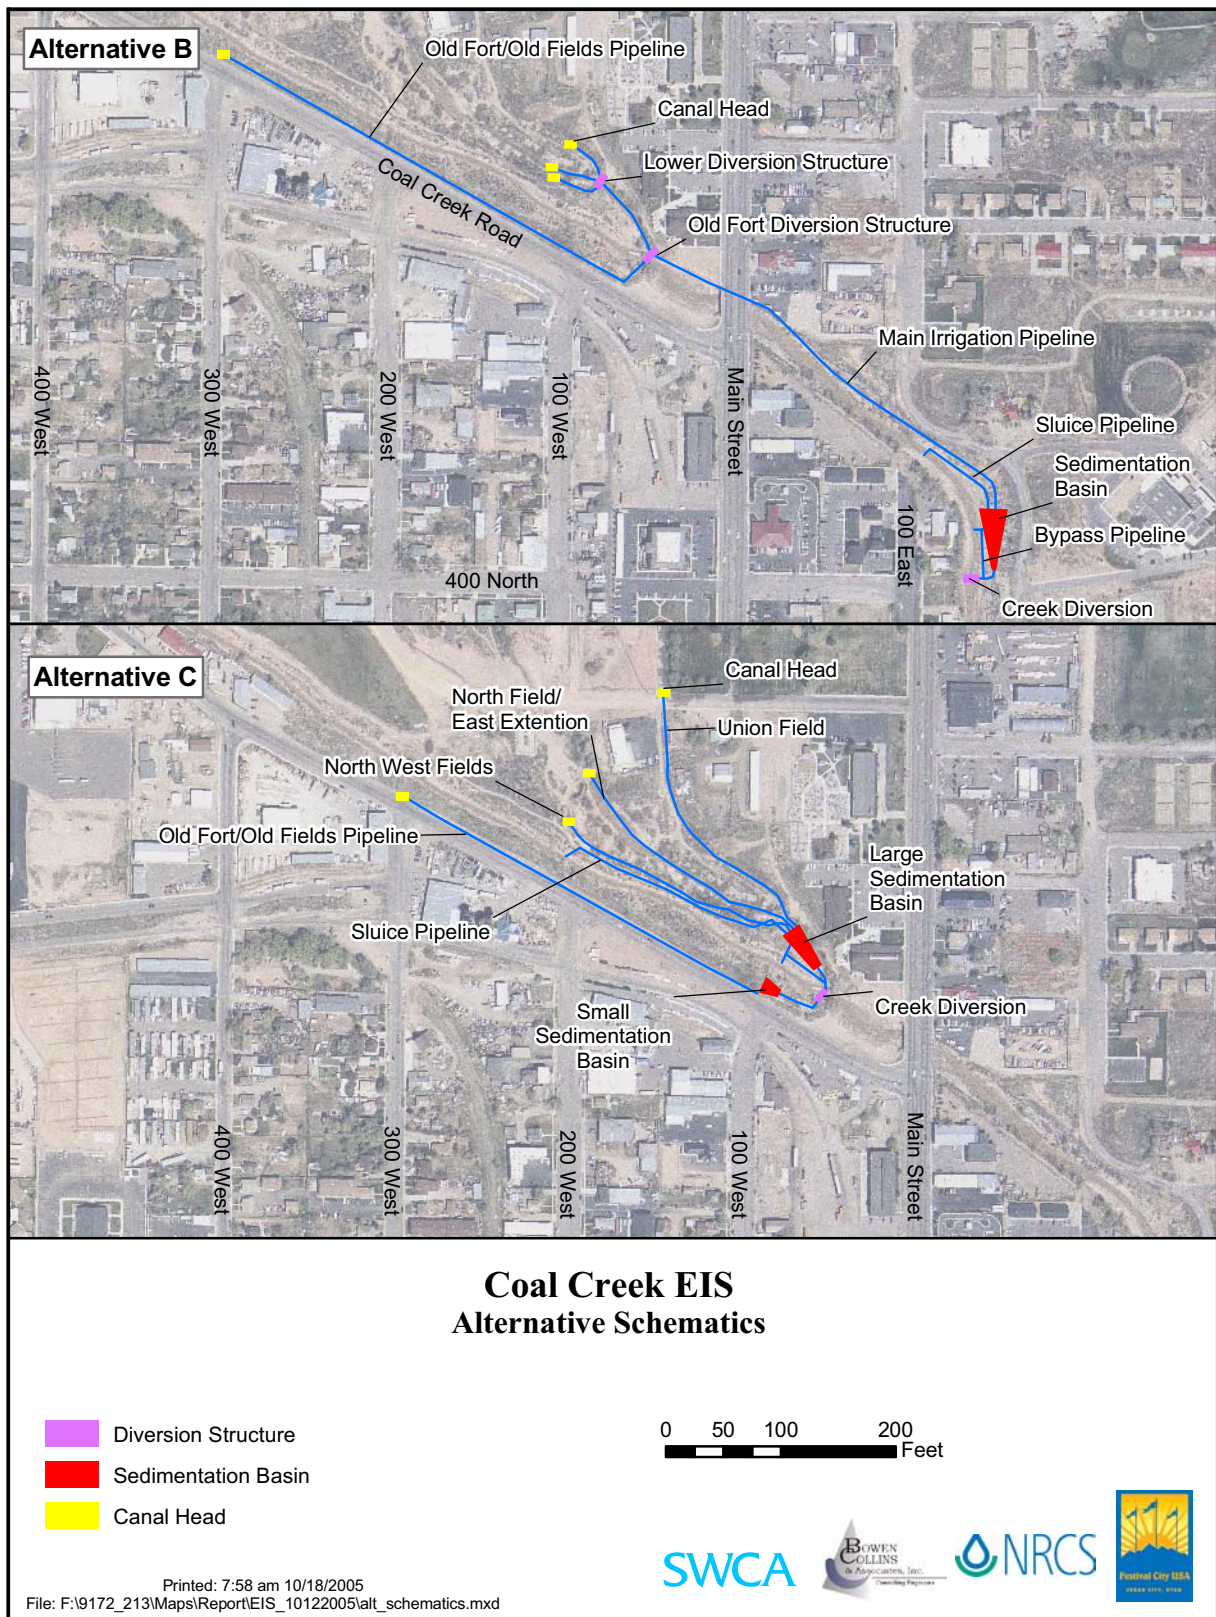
Proposed concepts for water diversion, sedimentation, and conveyance structures for Alternatives B and C.
